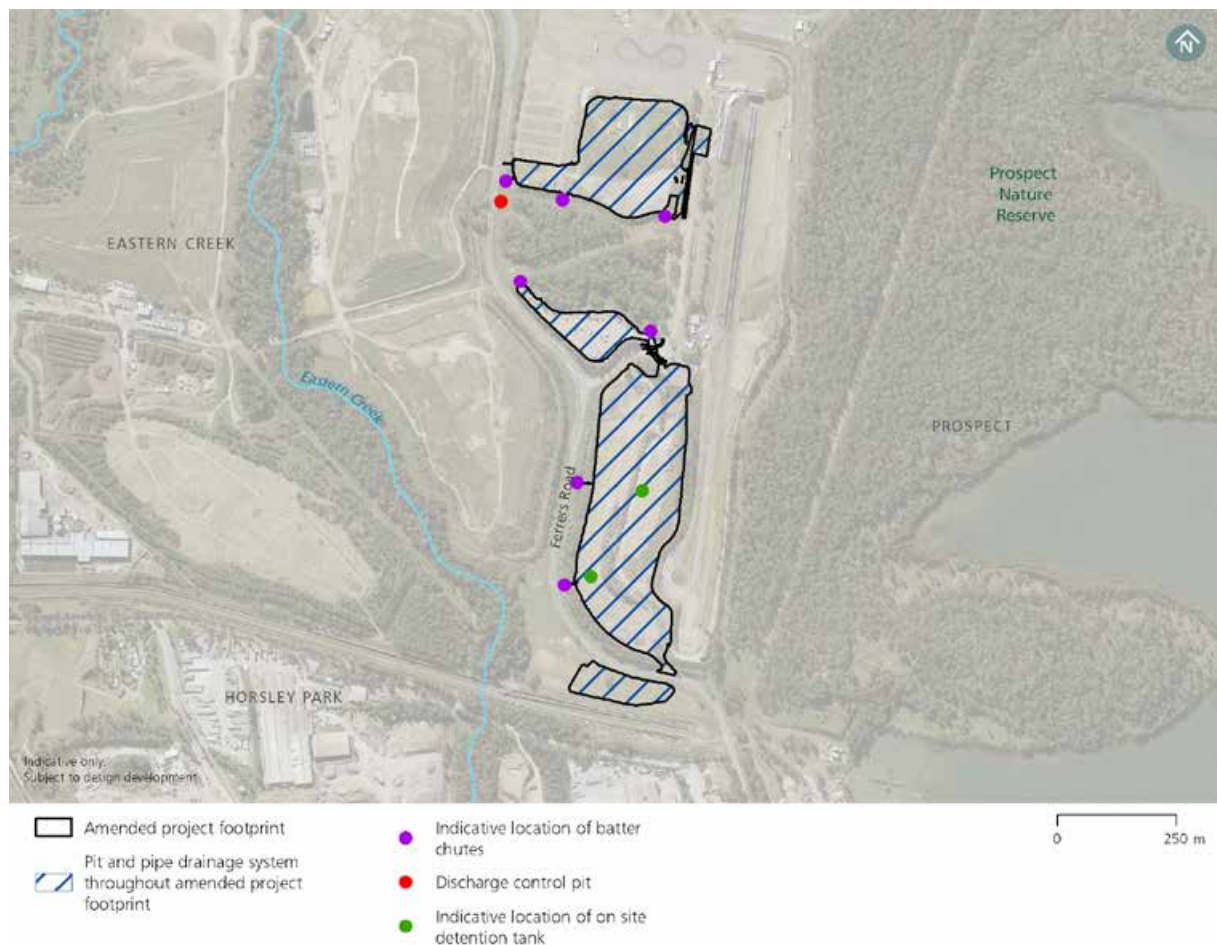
Indicative layout of the revised stormwater and drainage infrastructure
